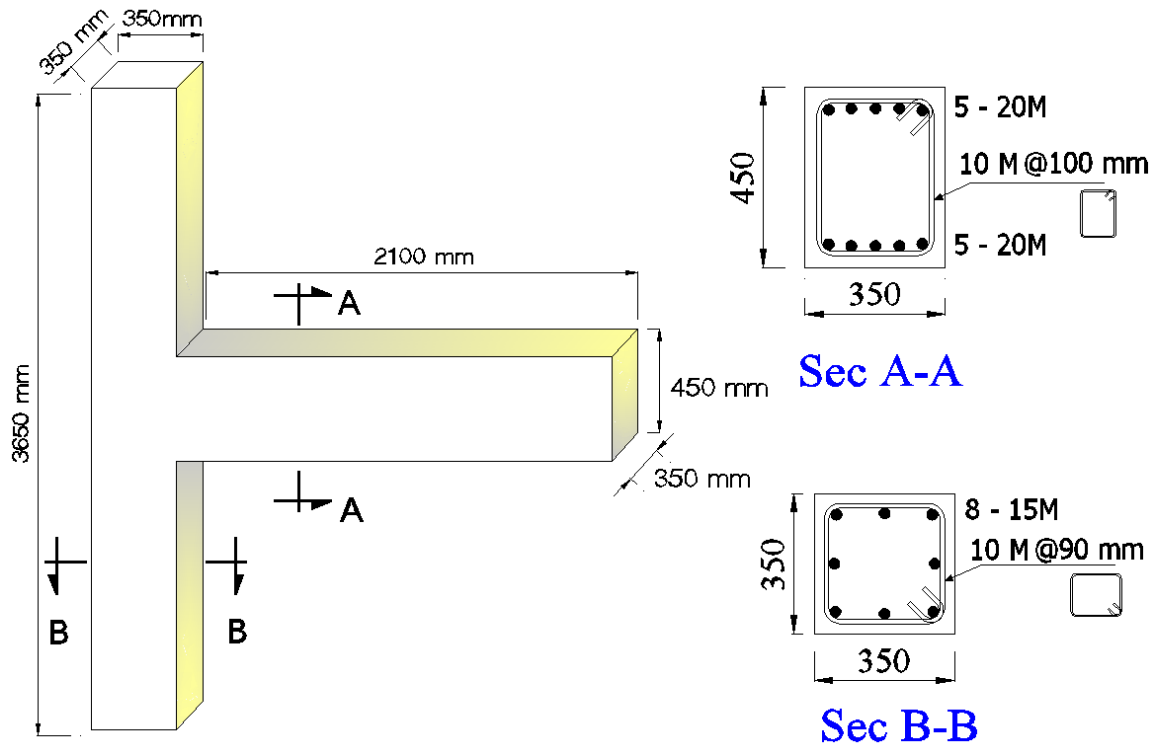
Concrete dimensions and reinforcement details of Specimen S0
